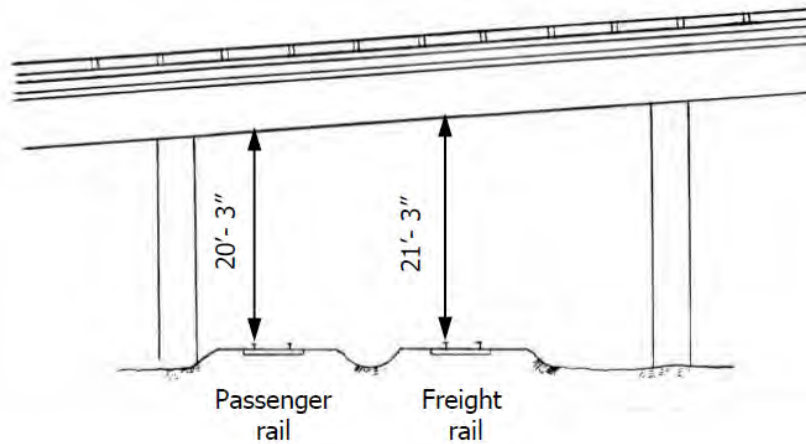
Bridge elevation view with one passenger rail and one freight rail track below the bridge (Example 2)
